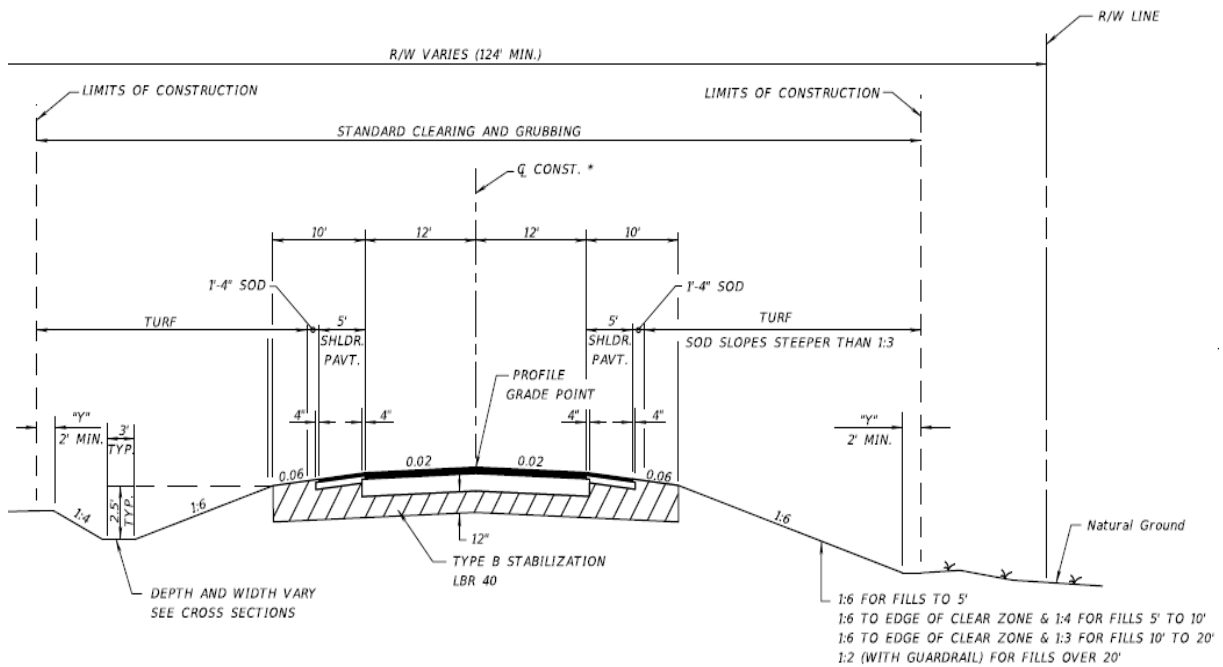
Typical Highway Cross-section in Florida (Florida Department of Transportation 2009)
